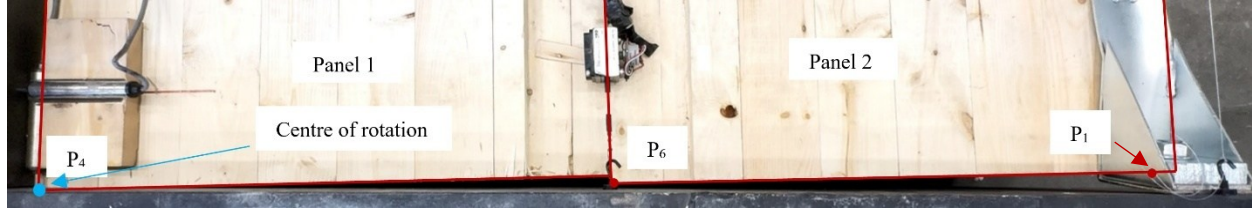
Failure details of specimen W0.6-P4-H2V32b
